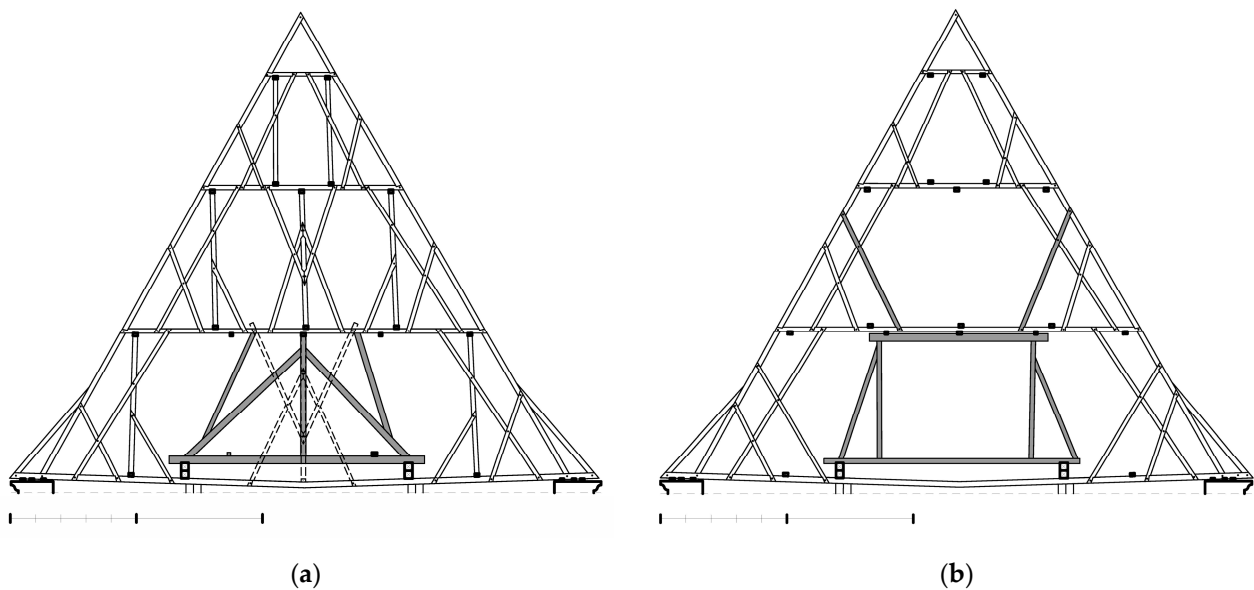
Bistrița church roof trusses. The 1897 interventions: (a) main truss; (b) 1926 interventions, secondary truss.
